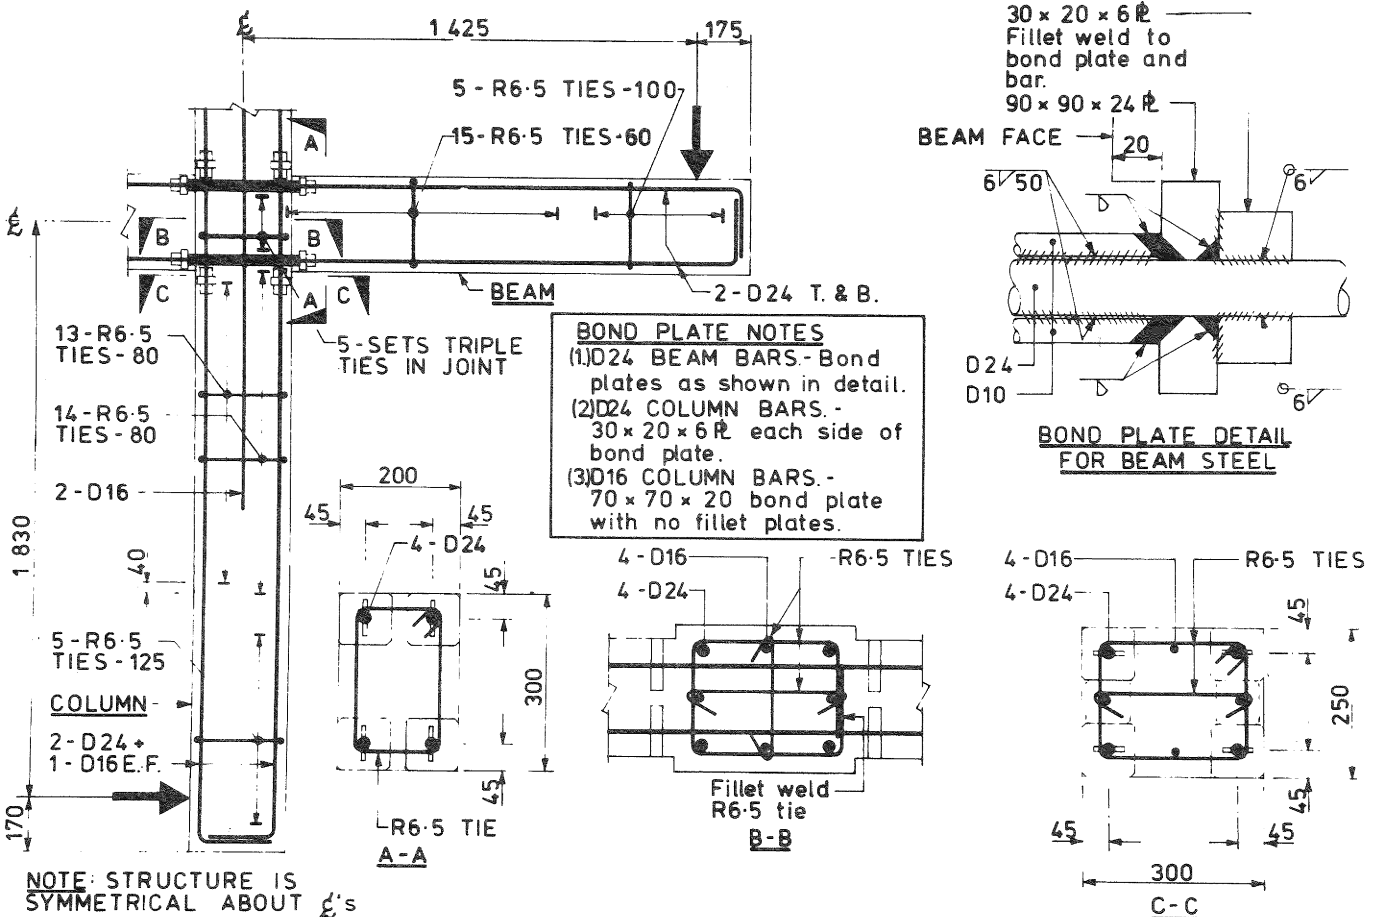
(b): REINFORCEMENT DETAILS FOR THE FOUR SPECIMENS (b) Unit 2
